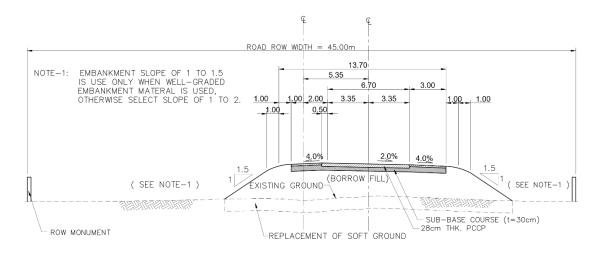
Typical Rodway Section for Lower Embankment at Initial Stage
